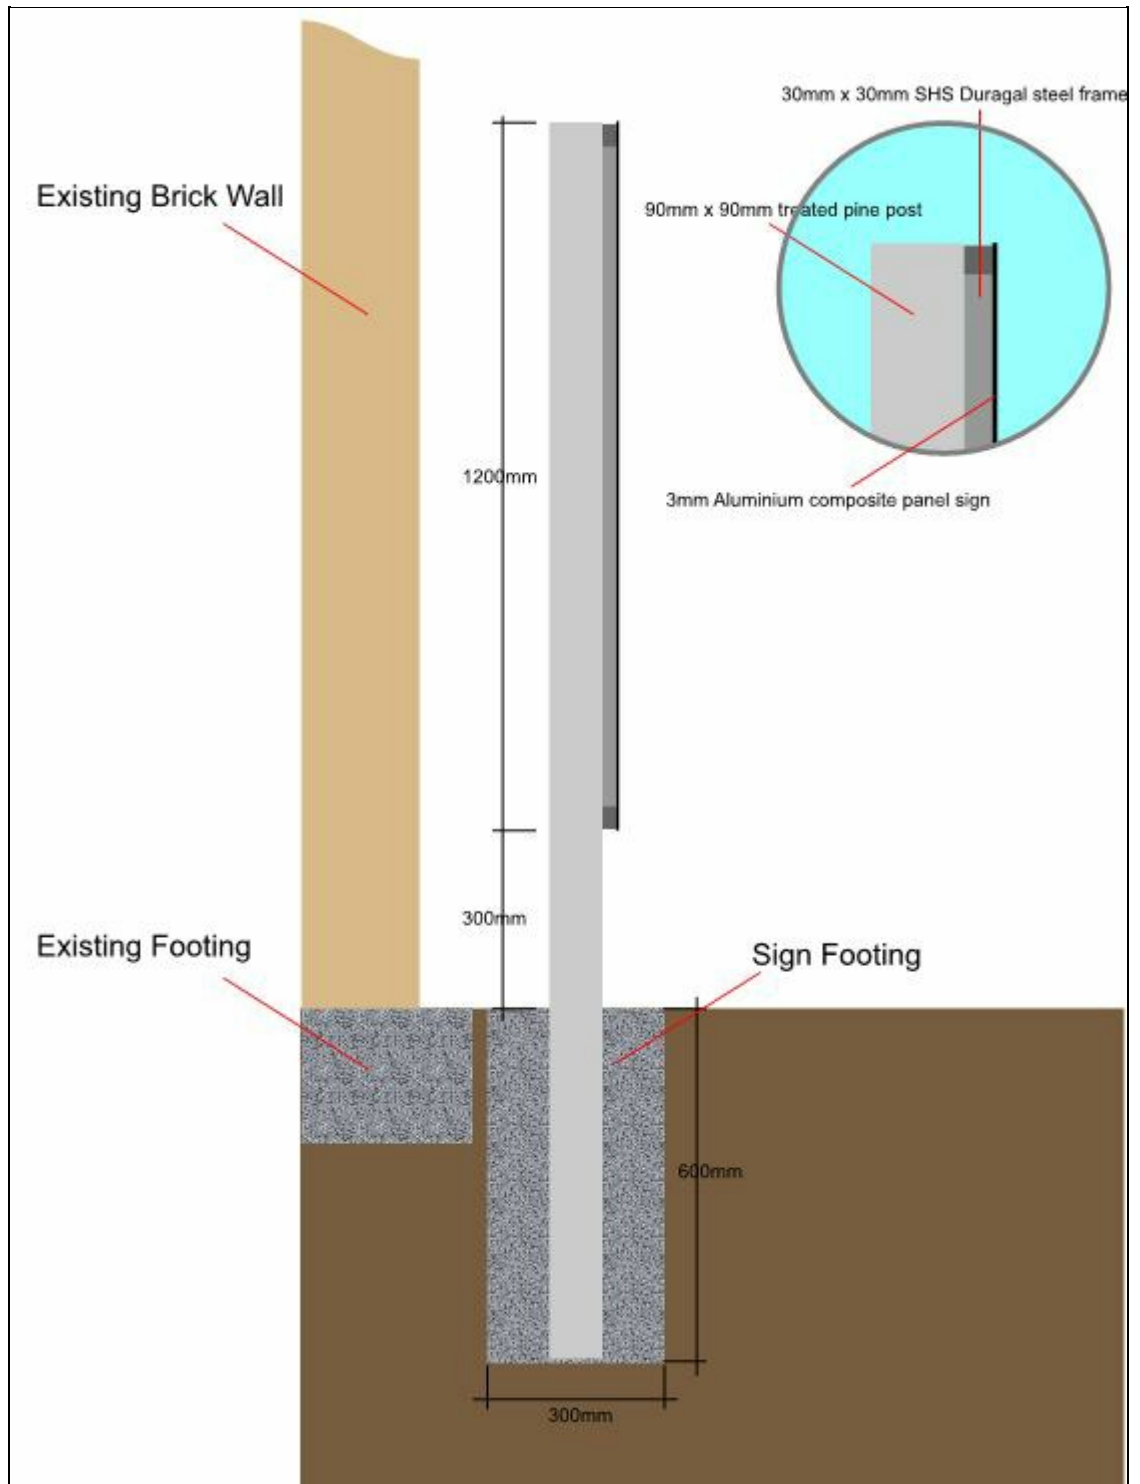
the proposed sign at 1-3 Elizabeth Street.
